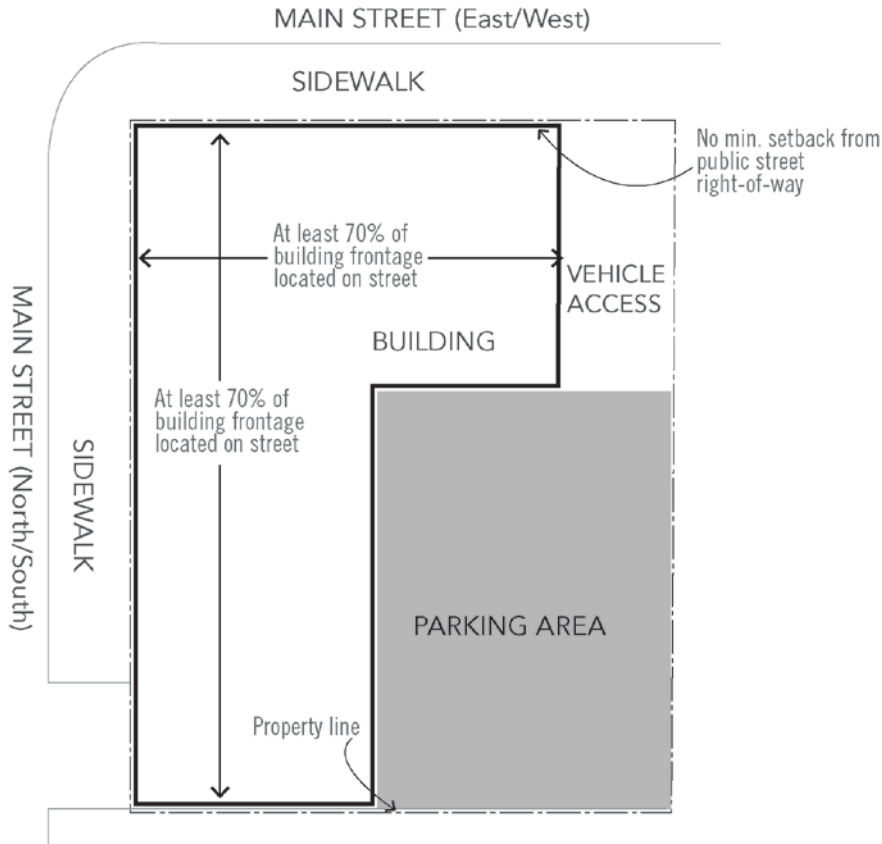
B. Building Placement and Location of Parking, Main Street/Local Street Intersection (typical)
